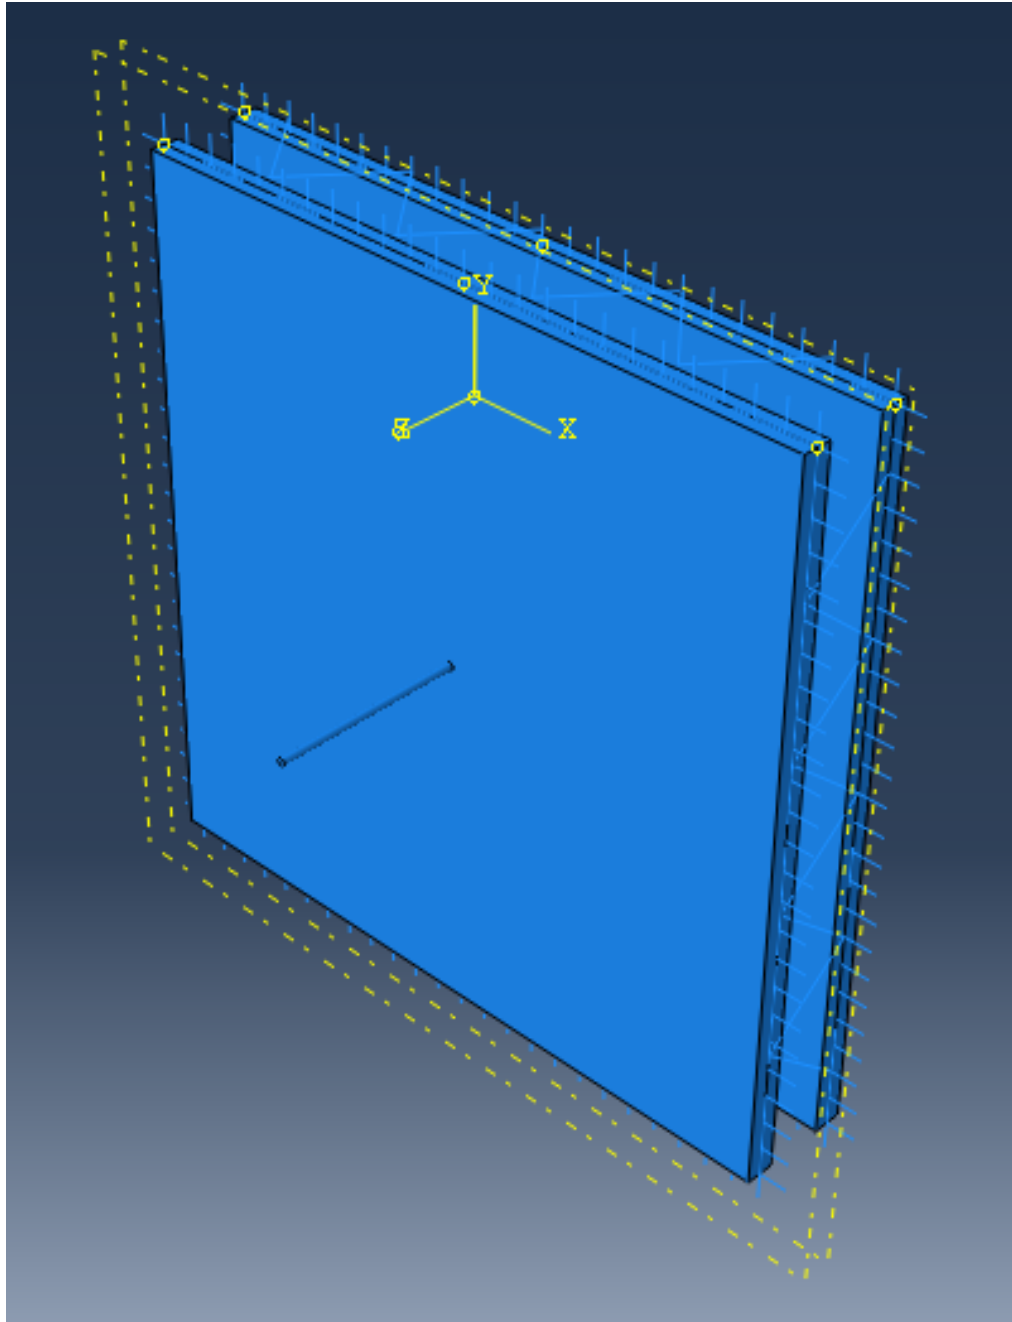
Two Concrete Layers and Steel Mesh with One Anchor and Steel Diagonals
